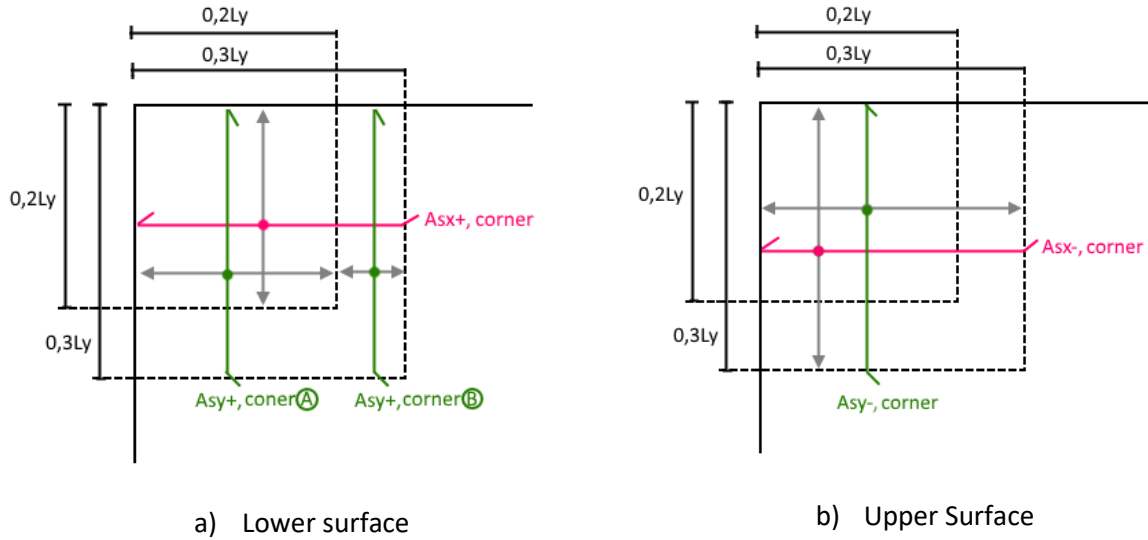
Example of a fixed edge-fixed edge Corner Reinforcement in both slab surfaces
